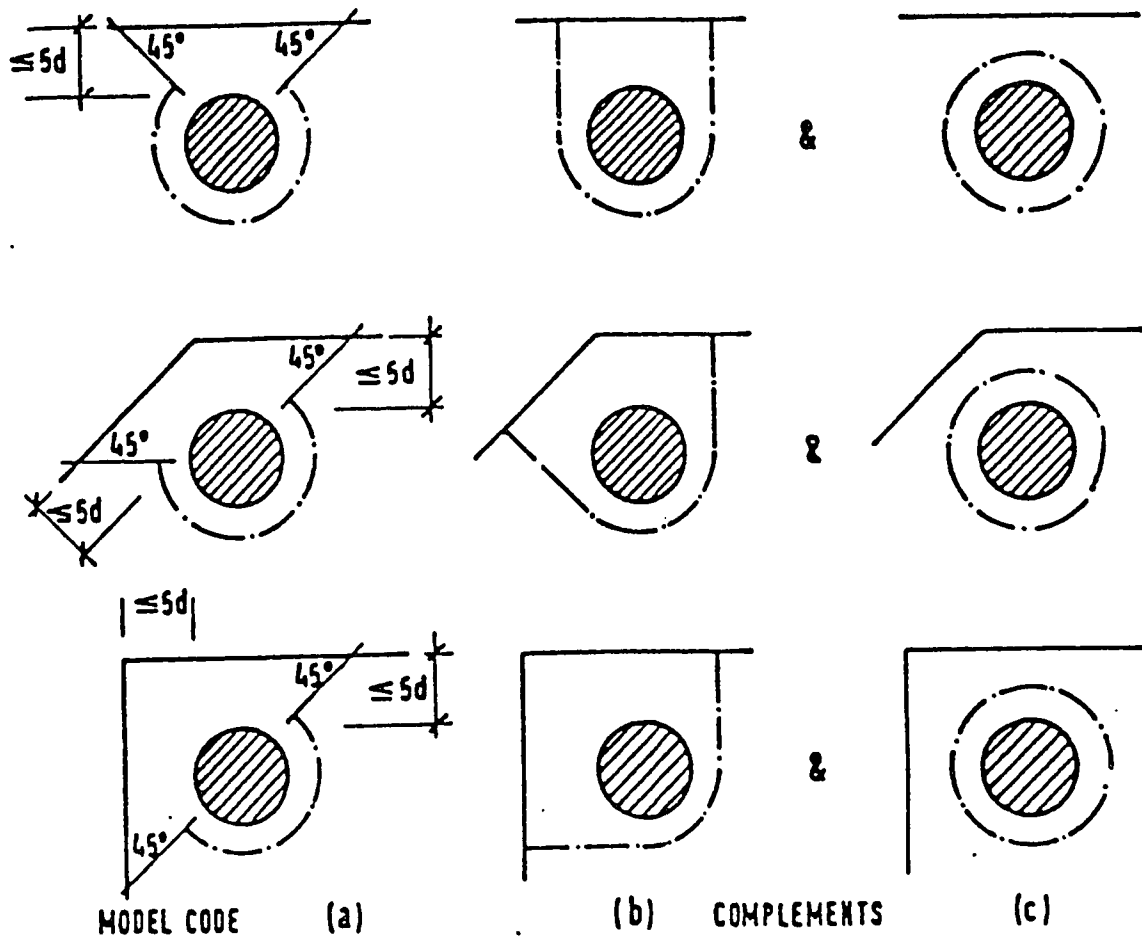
CEB Perimeters at Columns Near Slab Edges
